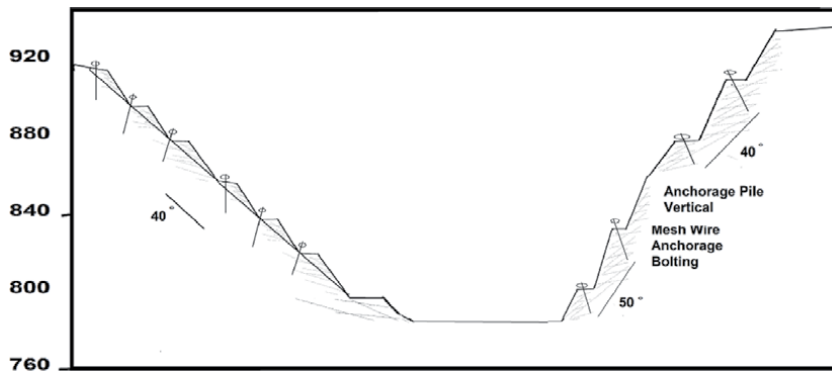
North and south steep slope faces of Avgamasya No. 1 pit of Şırnak asphaltite coal mine site and survey area with anchorage pattern.
